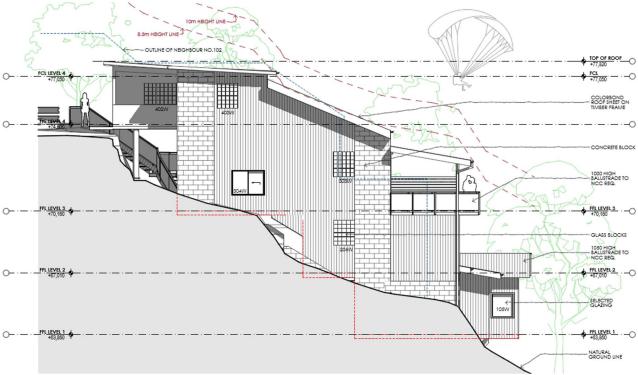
North East Elevation showing compliance with 8.5m height requirement.
